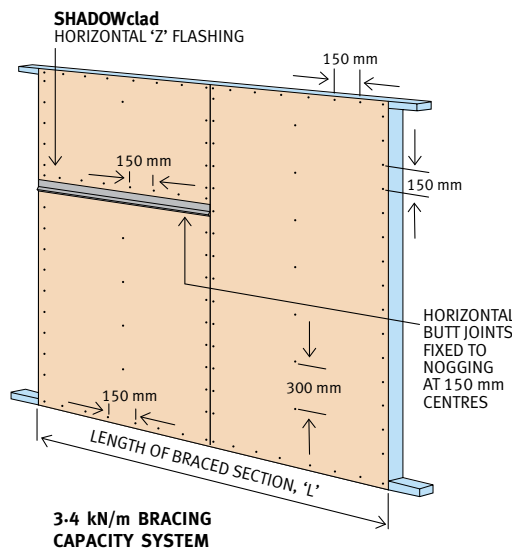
WALL SECTIONS (2440 SHEET ALTERNATIVE)
